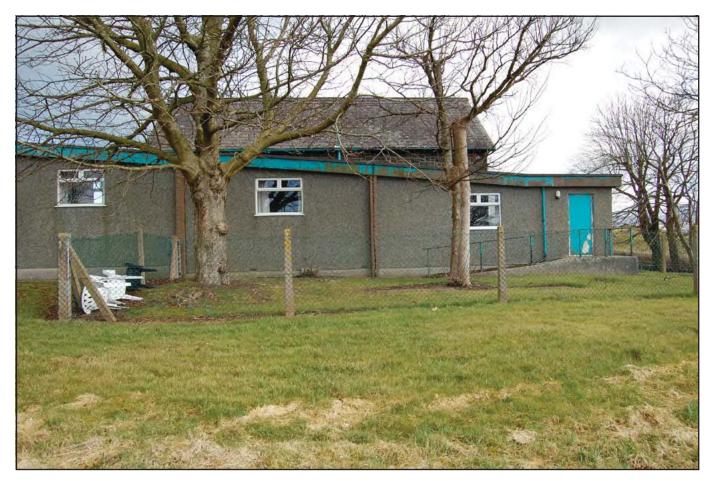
Link Corridor connecting Long and Short Stay Units: View east. Built 1991. Pebbledashed fronted with a box gutter and awning windows. Provides access to respective units; effectively masks the southwest facing elevations of both. Male ward wing of the Long Stay Unit is visible in the background as a slated pitched roof
